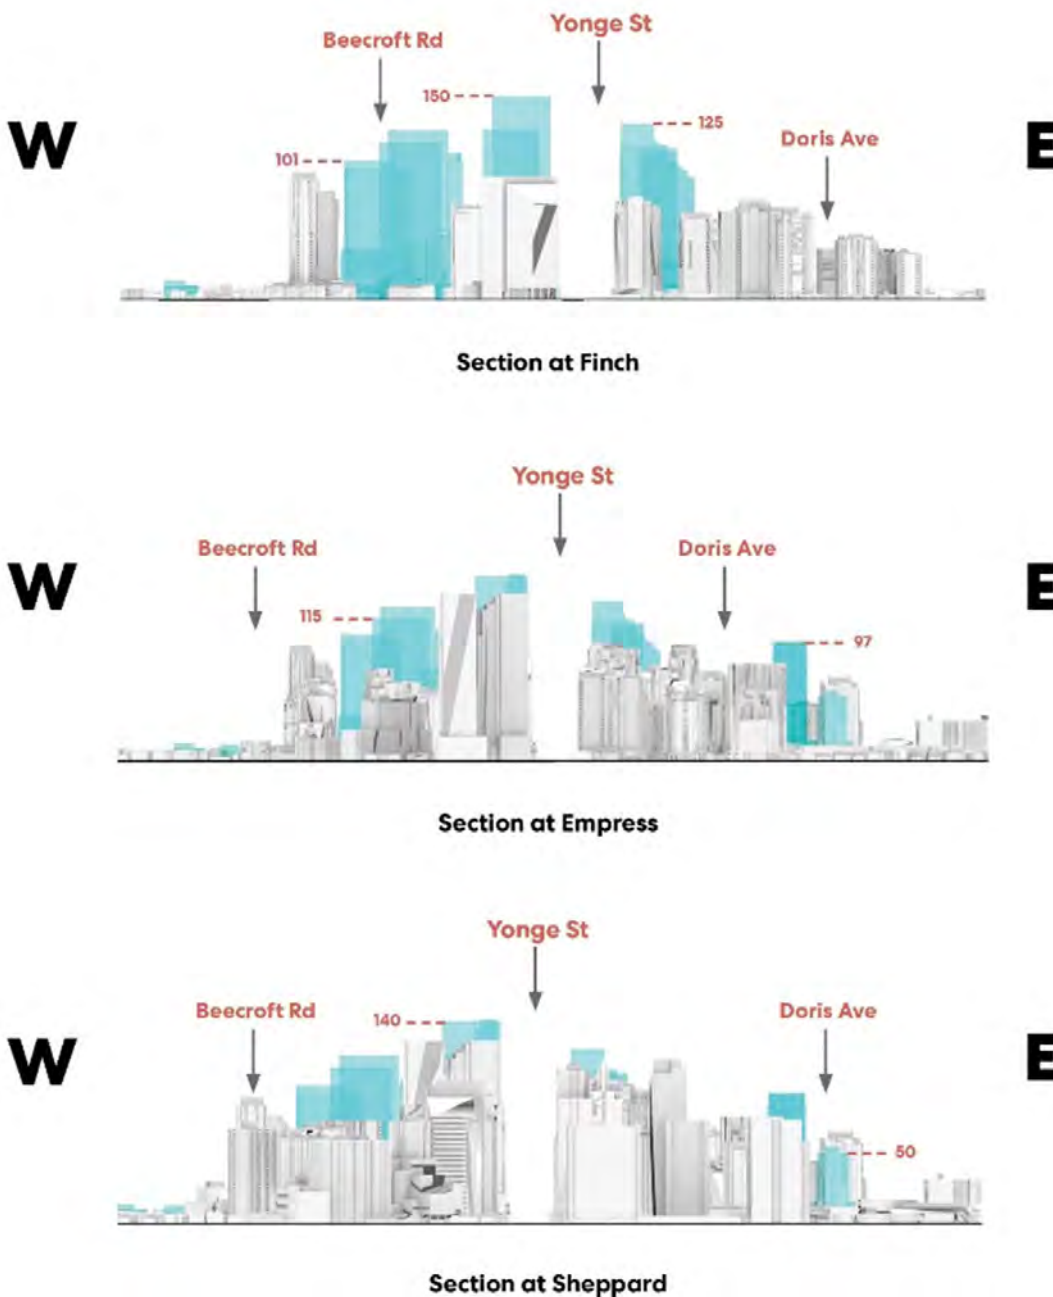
Sections Looking North on Yonge Street, Cut Along East-west Streets: Finch Avenue, Empress Avenue, and Sheppard Avenue with Existing (Grey) and Pipeline Developments in Blue
